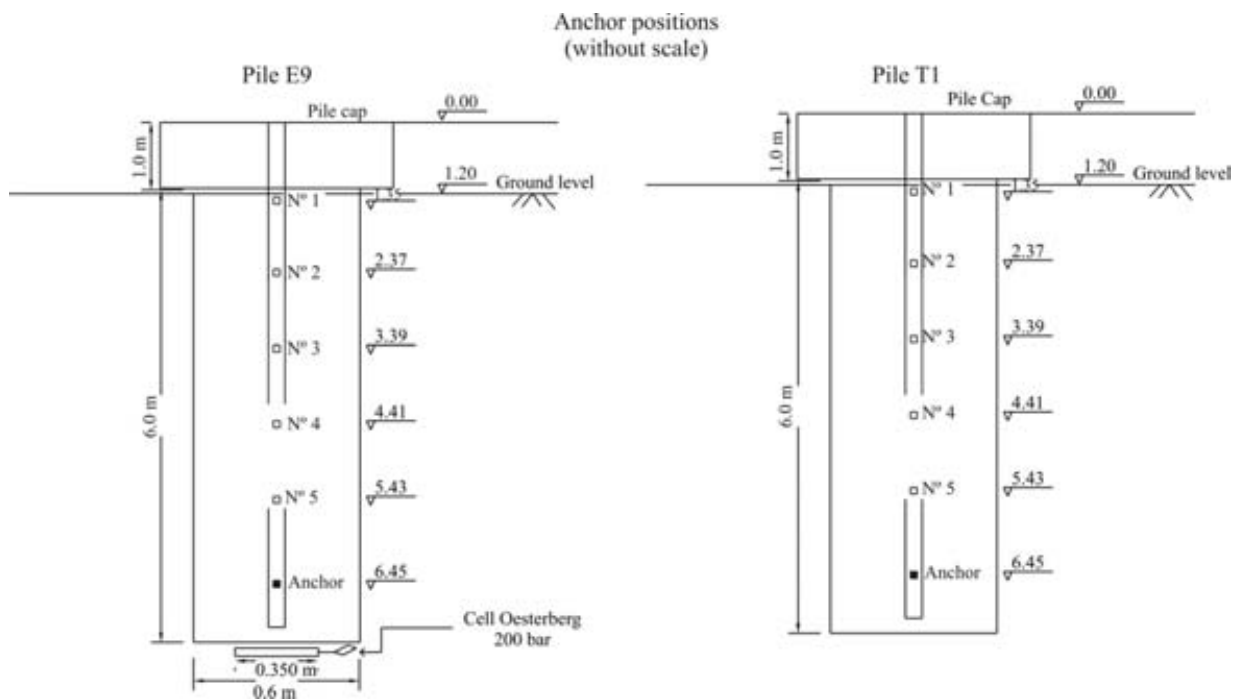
Location of sensors (retrievable extensometer) (Costa Esteves, 2005).
